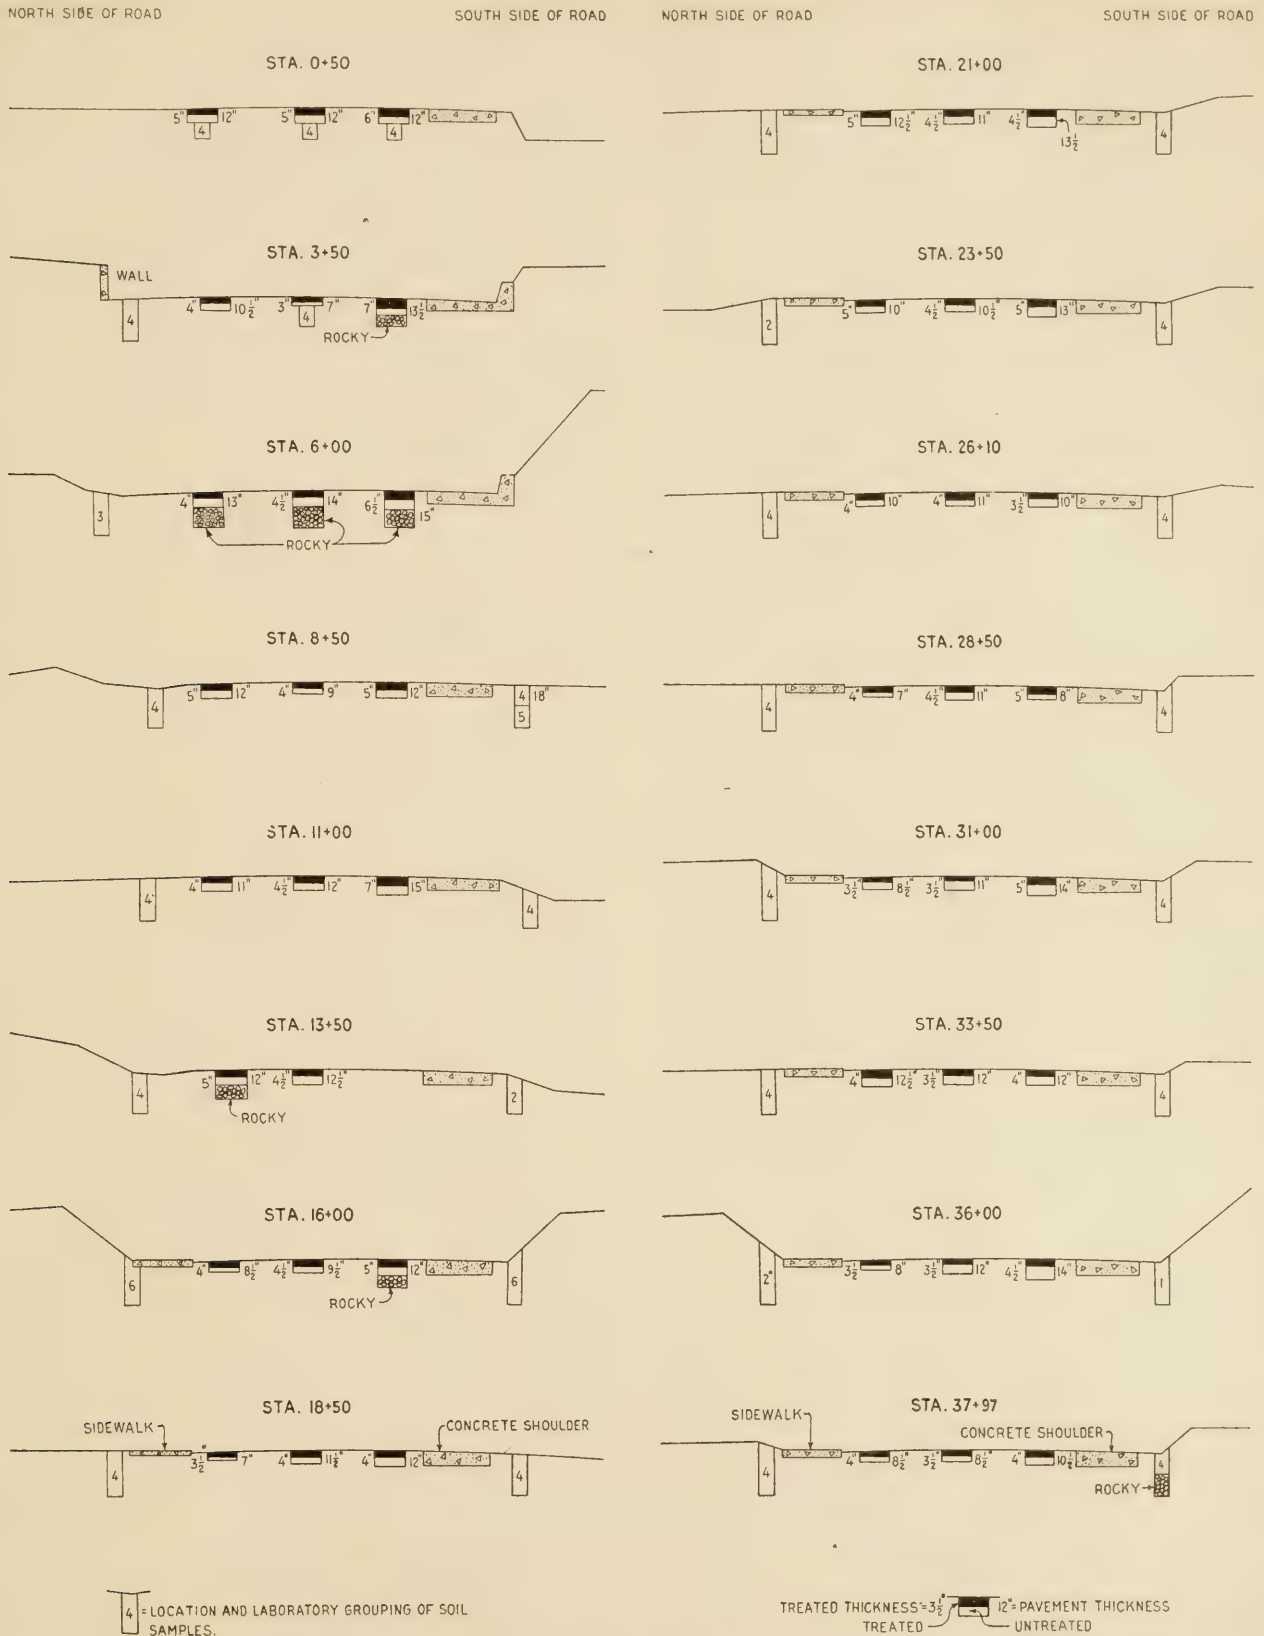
CROSS SECTIONS OF BRADLEY LANE SHOWING PAVEMENT THICKNESS AND LOCATION OF SOIL SAMPLES
